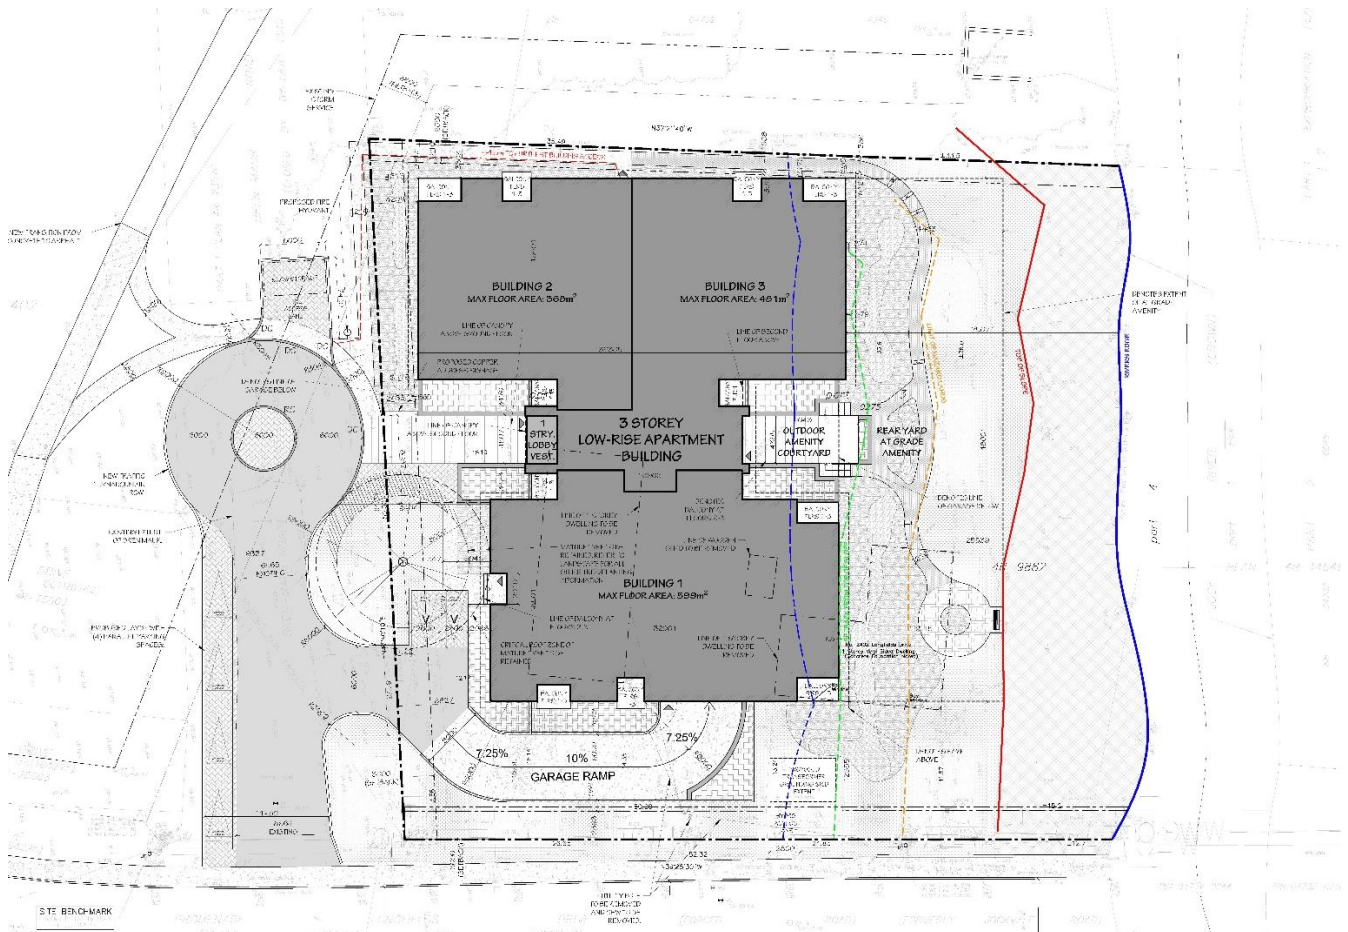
Proposed Site Plan (Source: Hobin Architecture).
